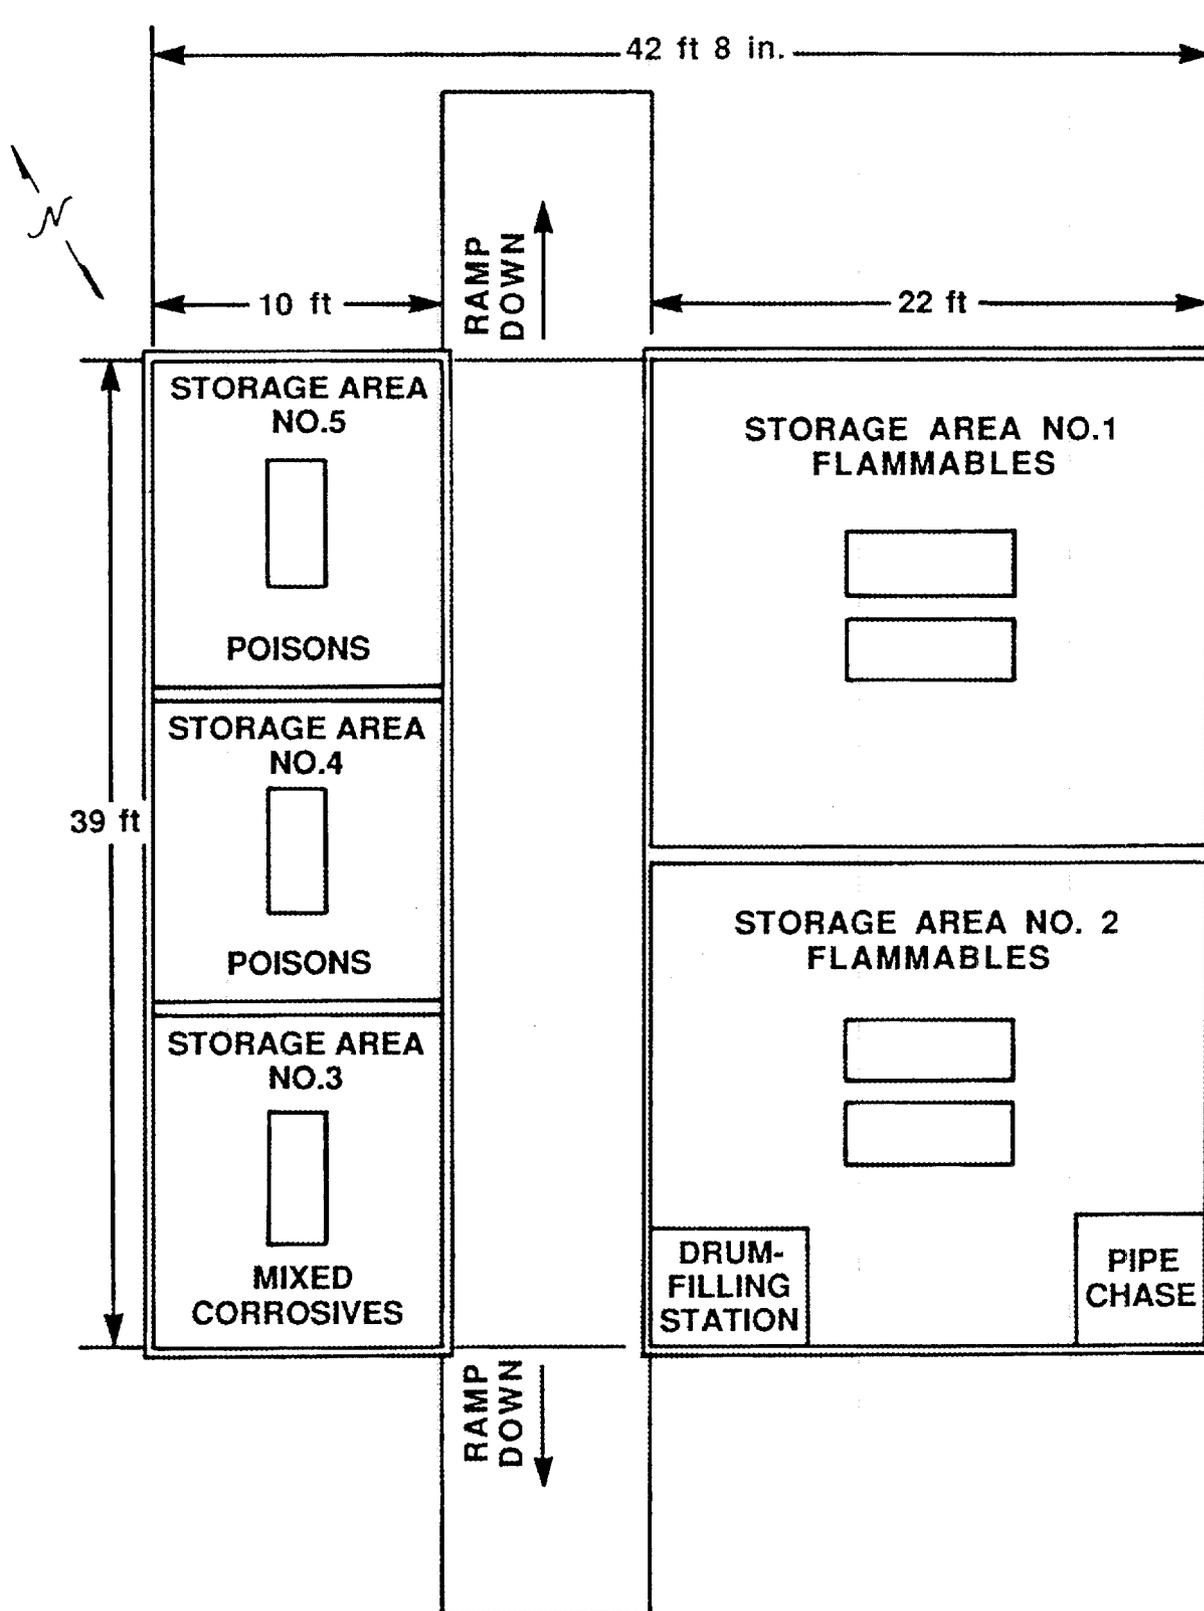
Layout of Building 7654, Long-Term Hazardous Waste Storage Facility.
